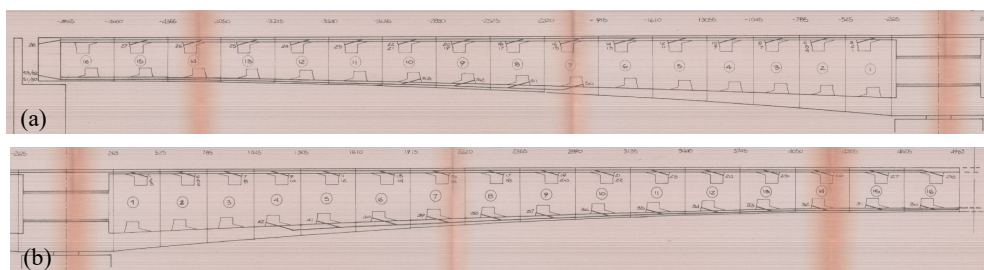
Prestressing tendons layout: abutment-pier (a); pier-midspan (b).
